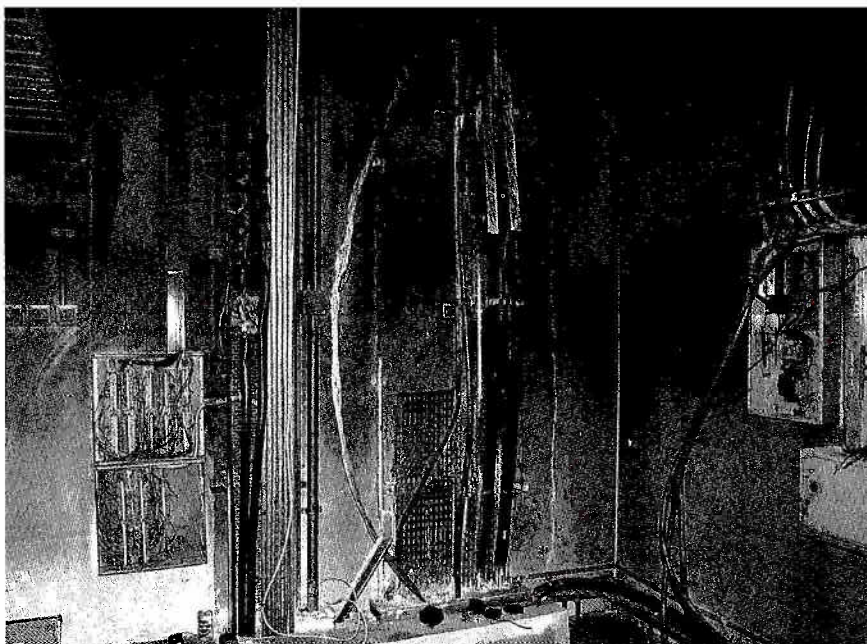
Heat and smoke damage in electrical room of MEW building
